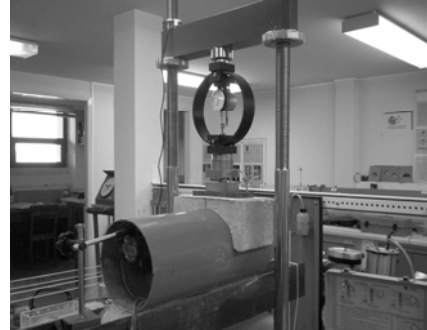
Testing arrangement for loading a 3-D tunnel model
